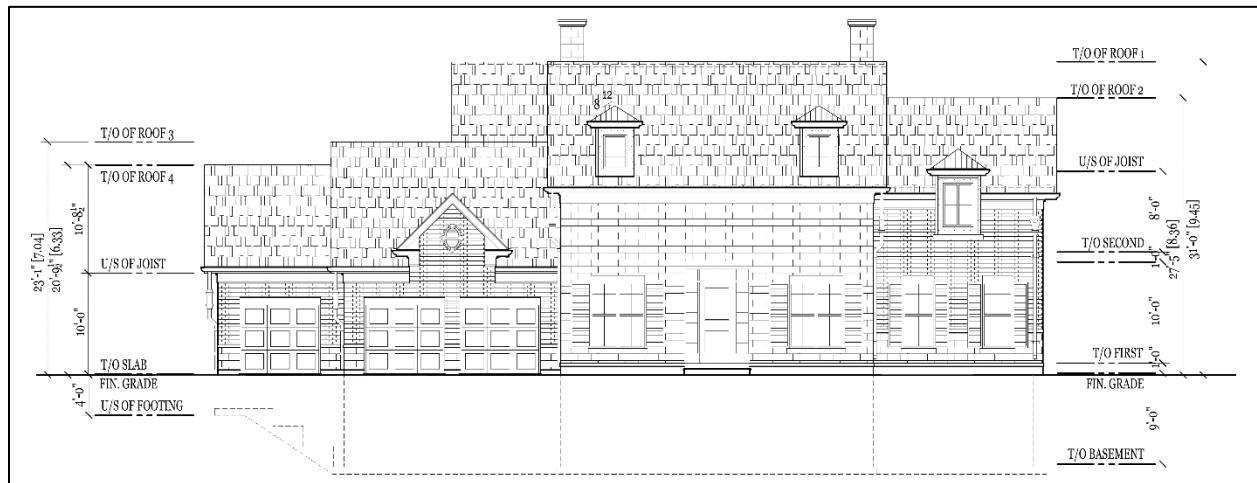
Proposed elevation drawings (Frasca Planning and Design 2019)
